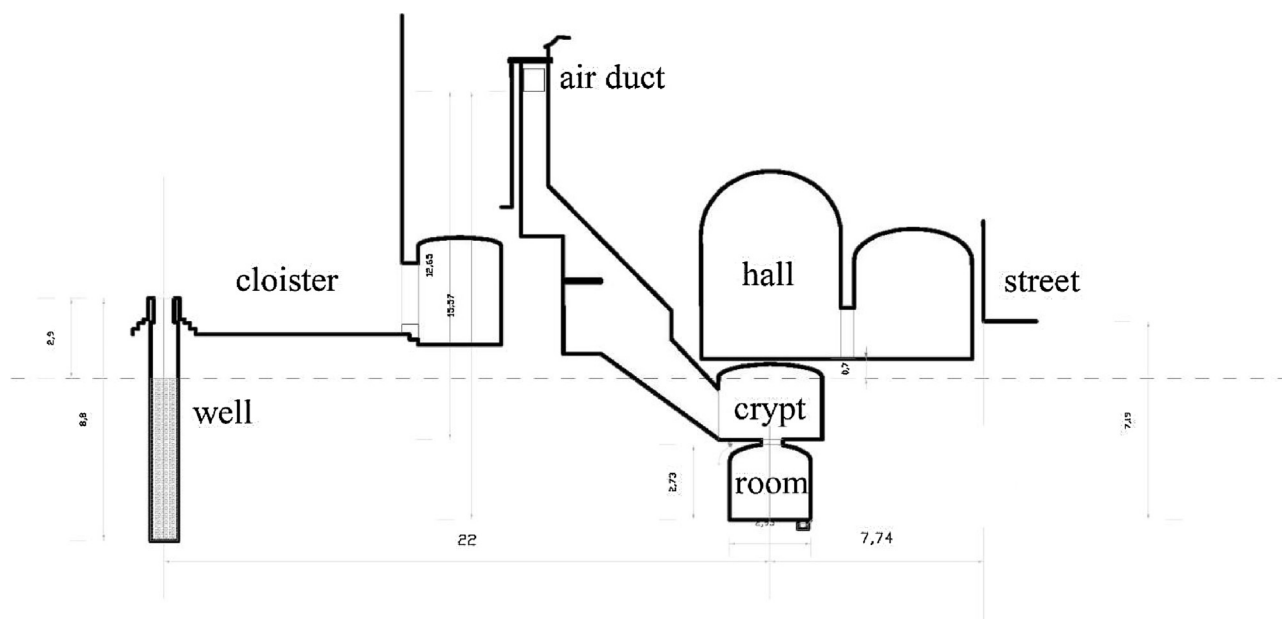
Partial section of the Abbey (hall) with crypt and its air duct, underneath room, lateral cloister, and well (edited from R. Lavezzaro).
